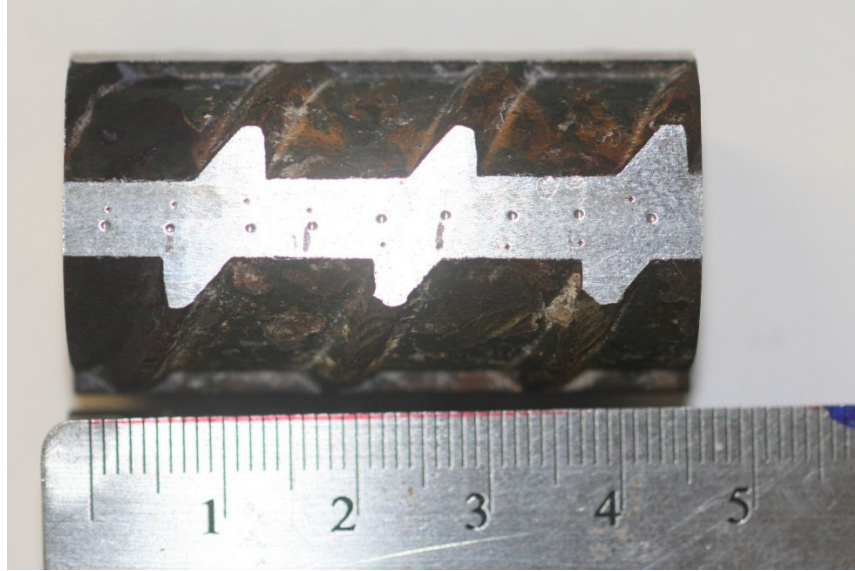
Rockwell indentation on a ground flat surface of a deformed reinforcing steel bar.
